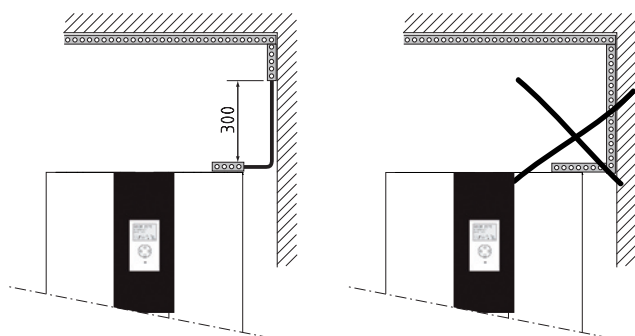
Recommended distance between trunking on the wall and trunking on the heat pump is 300mm.
